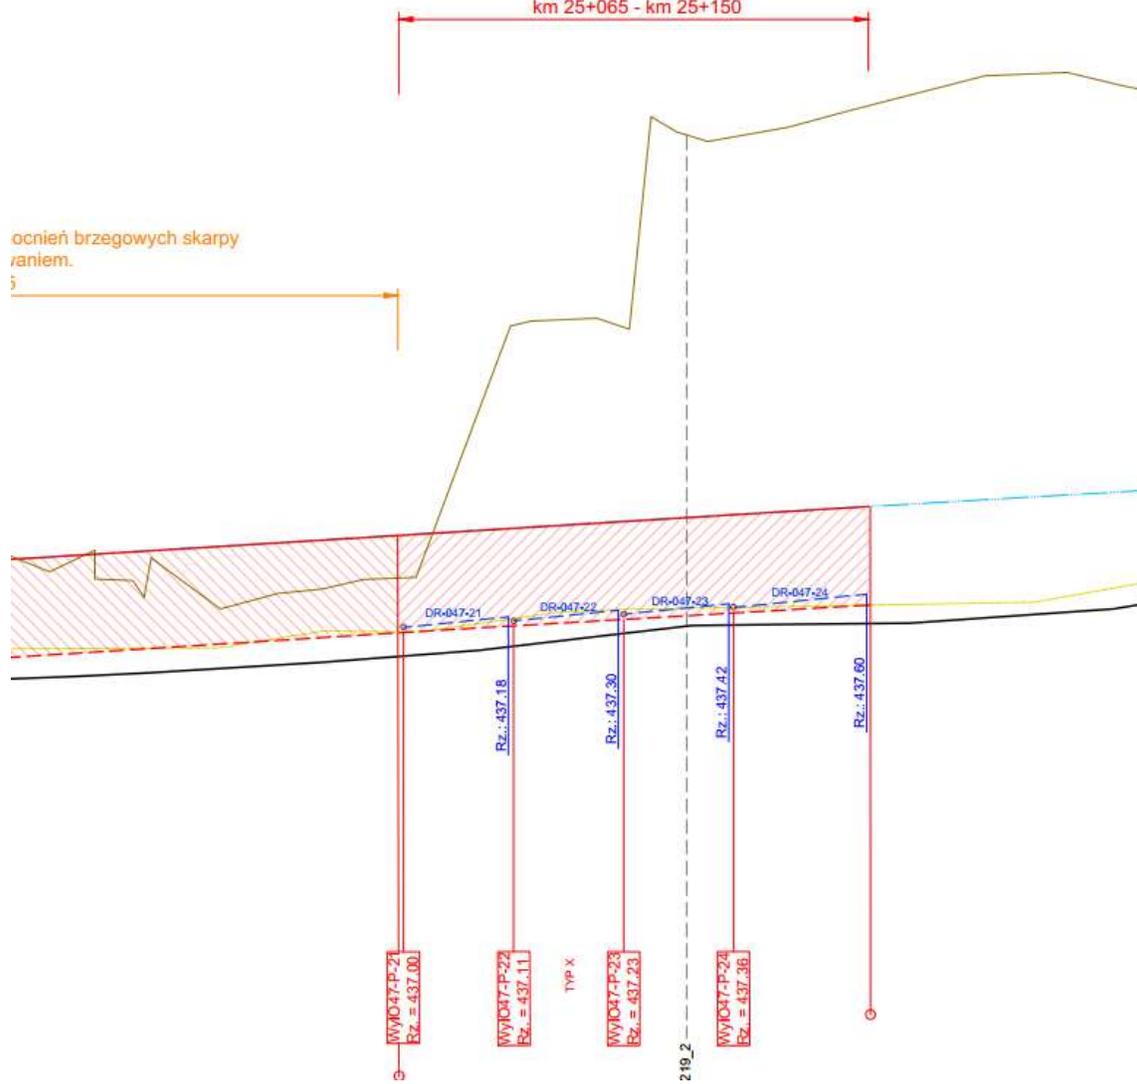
A section of the longitudinal profile - the right river bank at km 25+065 – 25+150.
